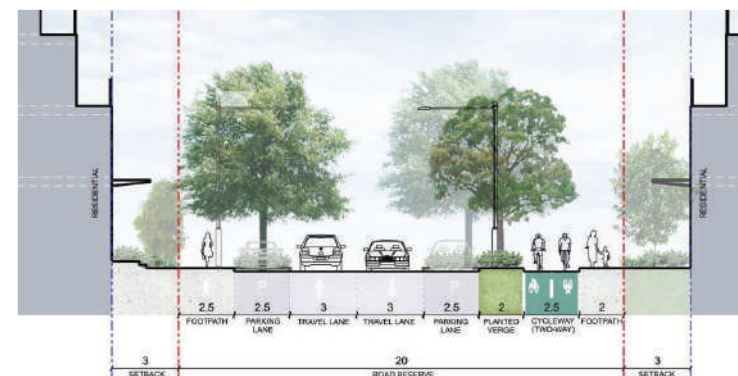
Denham Street, Denham Street Extension (New Street) and Llewellyn Street - Typical Section
